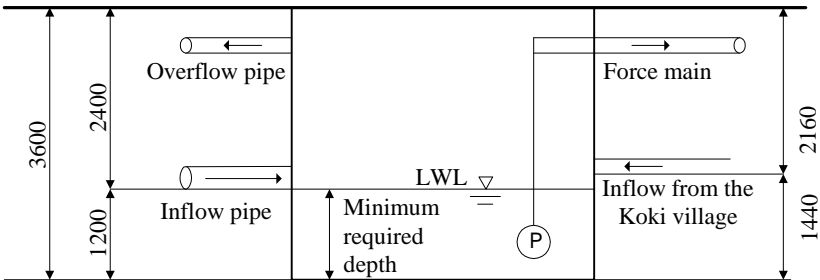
Planned Koki Pumping Station Section (Case 2)
